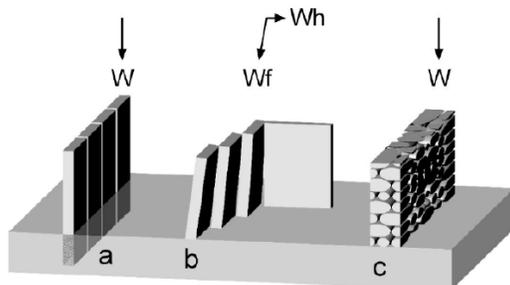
Schematics of the three construction systems used in the walls of Neolithic dolmens on the Iberian Peninsula: (a) orthostatic walls, (b) walls of imbricated slabs, and (c) walls of masonry. See the text for a complete explanation.
